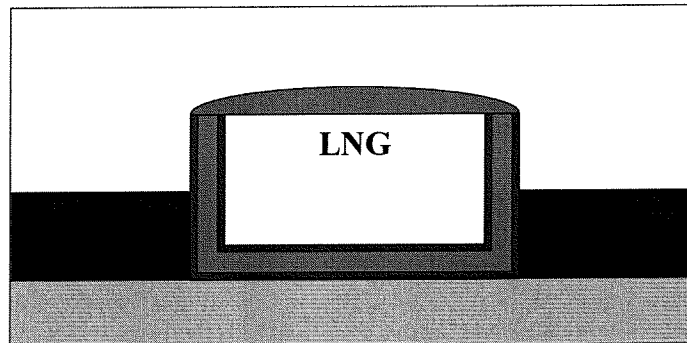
Tank founded on land-fill surrounded by quay walls
